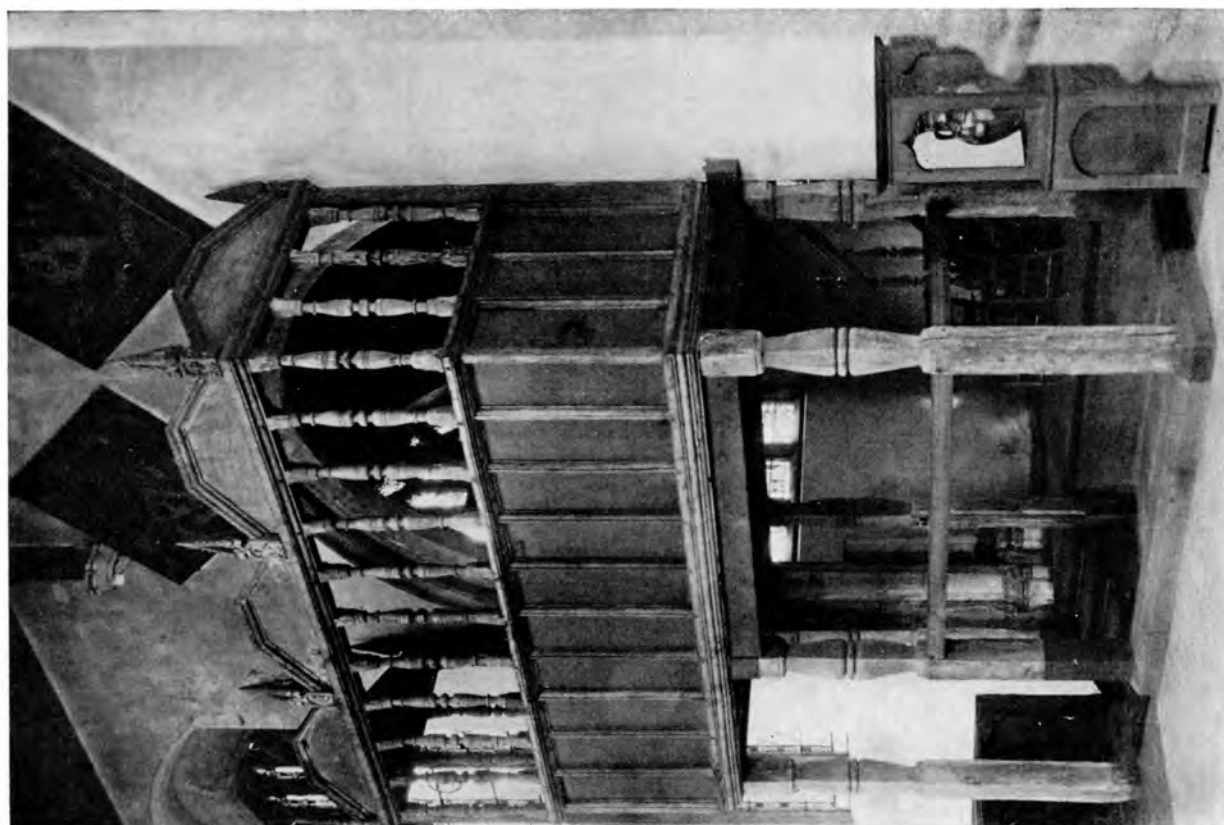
DETAIL OF FARMHOUSE NEAR WALBERSWICK, SUFFOLK
